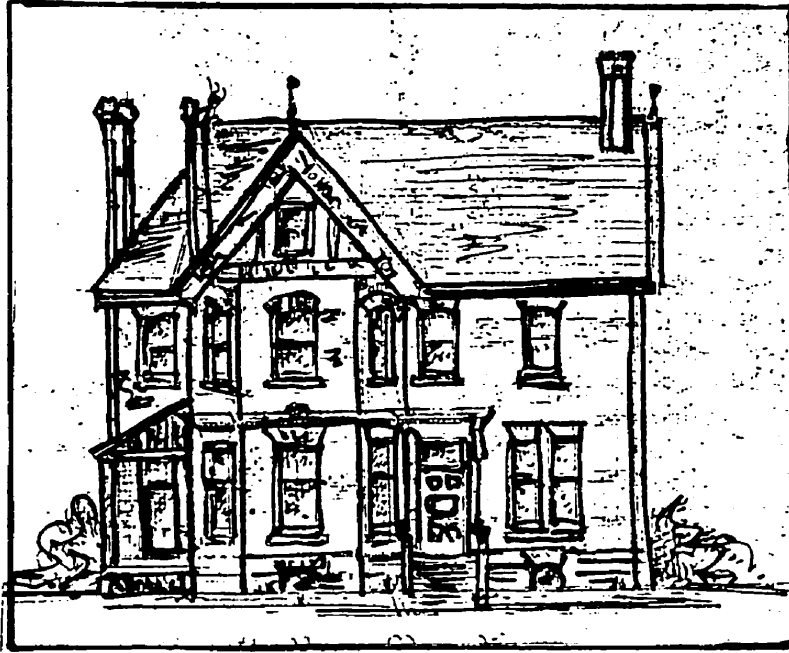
272 Park Street, East Elevation. Architectural plans, July 18, 1881
